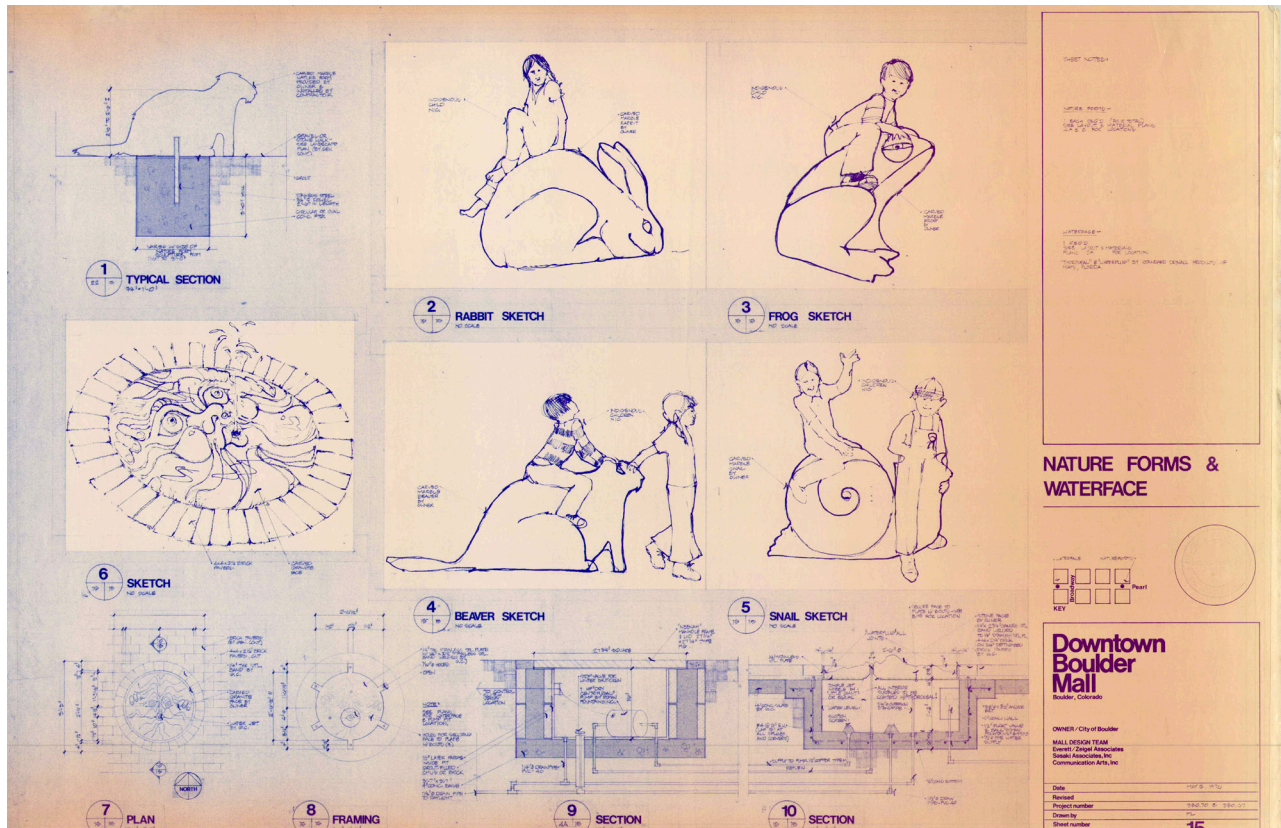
Nature Forms play node construction details, 1976 (source: City of Boulder)
